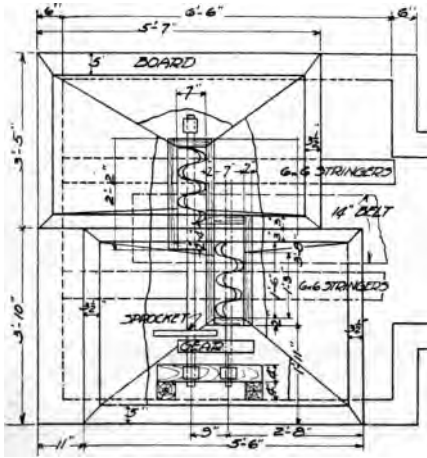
PLAN, BELT CONVEYOR EQUIPMENT AT OUTSIDE HOPPER. SEE FIGS. 20, 21, 22, 23
